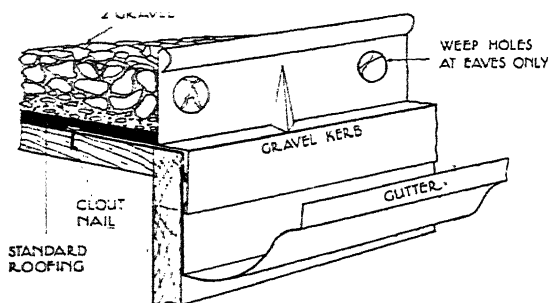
SECTION SHOWING GUTTER FIXED TO FASCIA AND EAVES KERB IN POSITION
